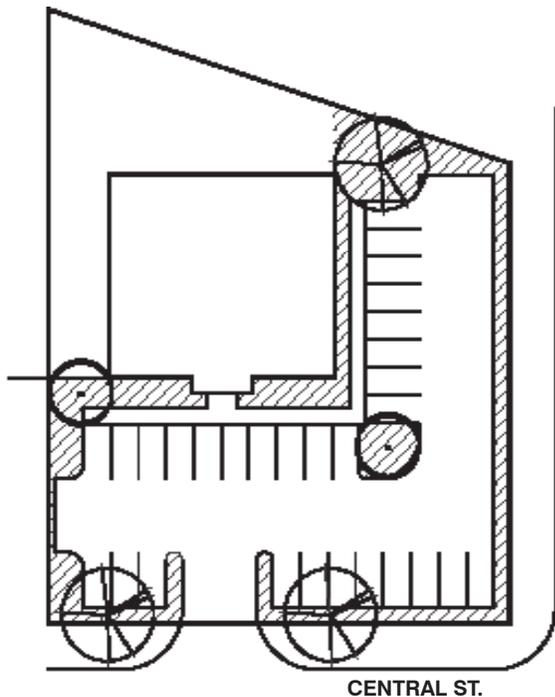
Landscaped Street Yard Dual Street Frontage
